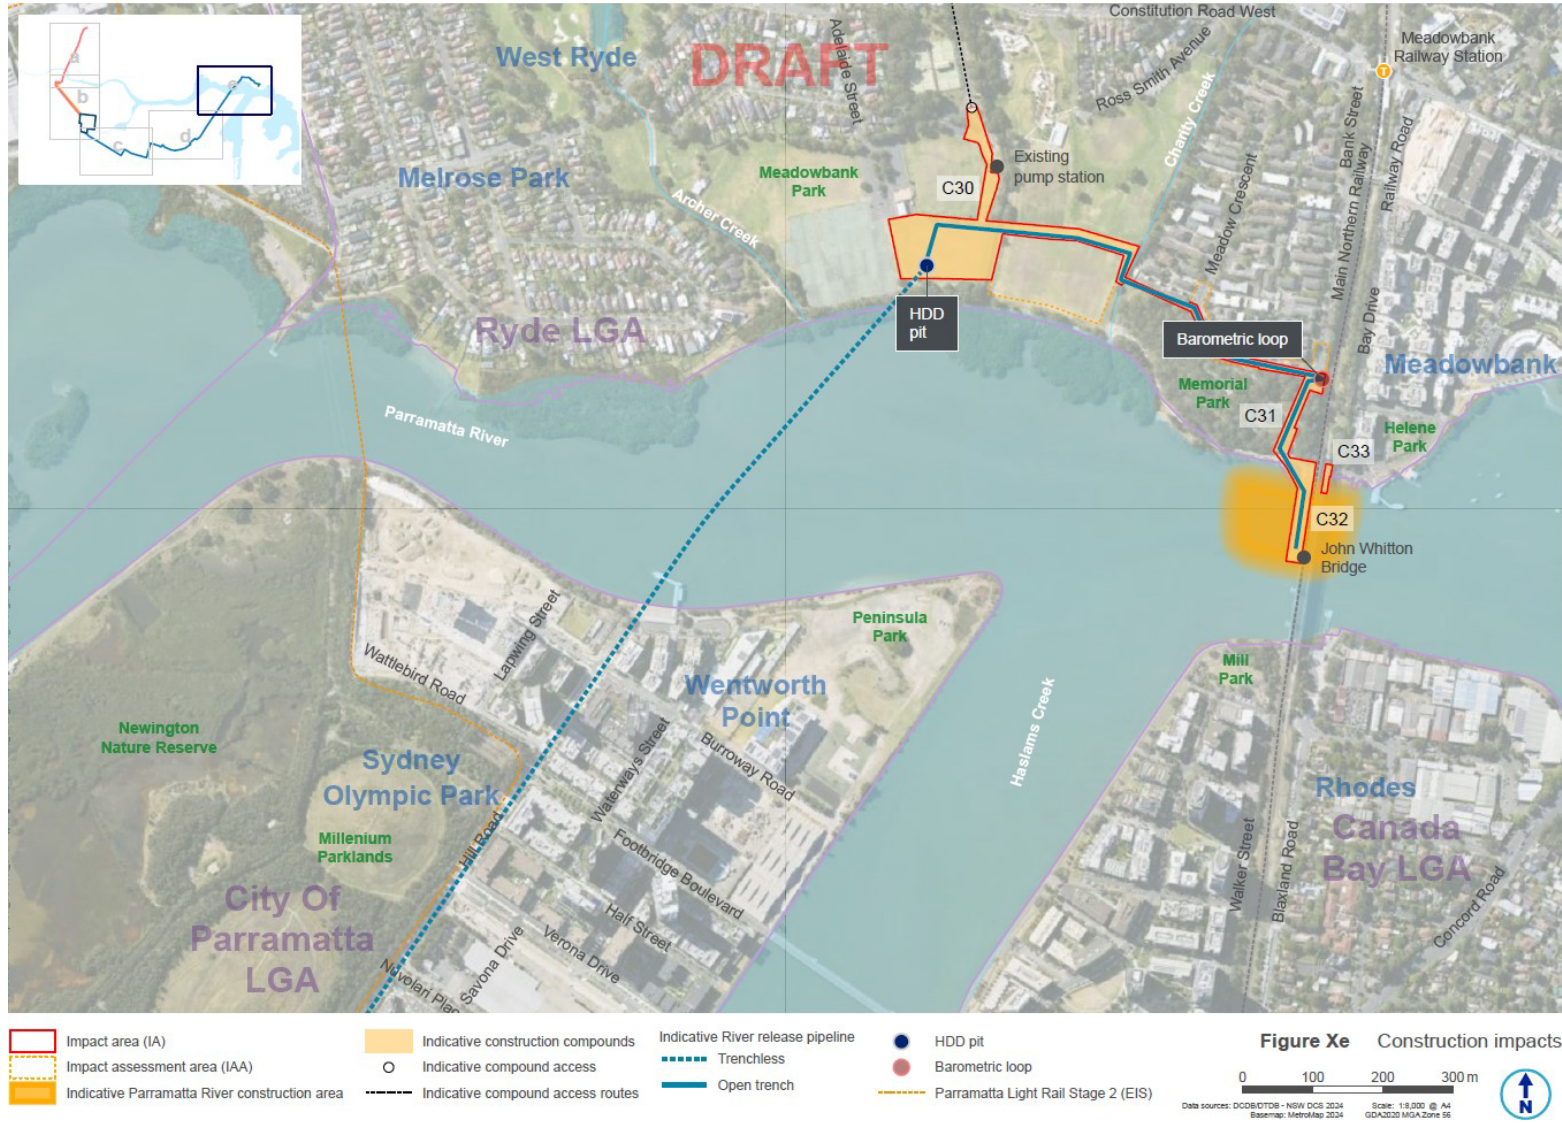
Construction Impacts at Meadowbank release site (near John Witton Bridge)
